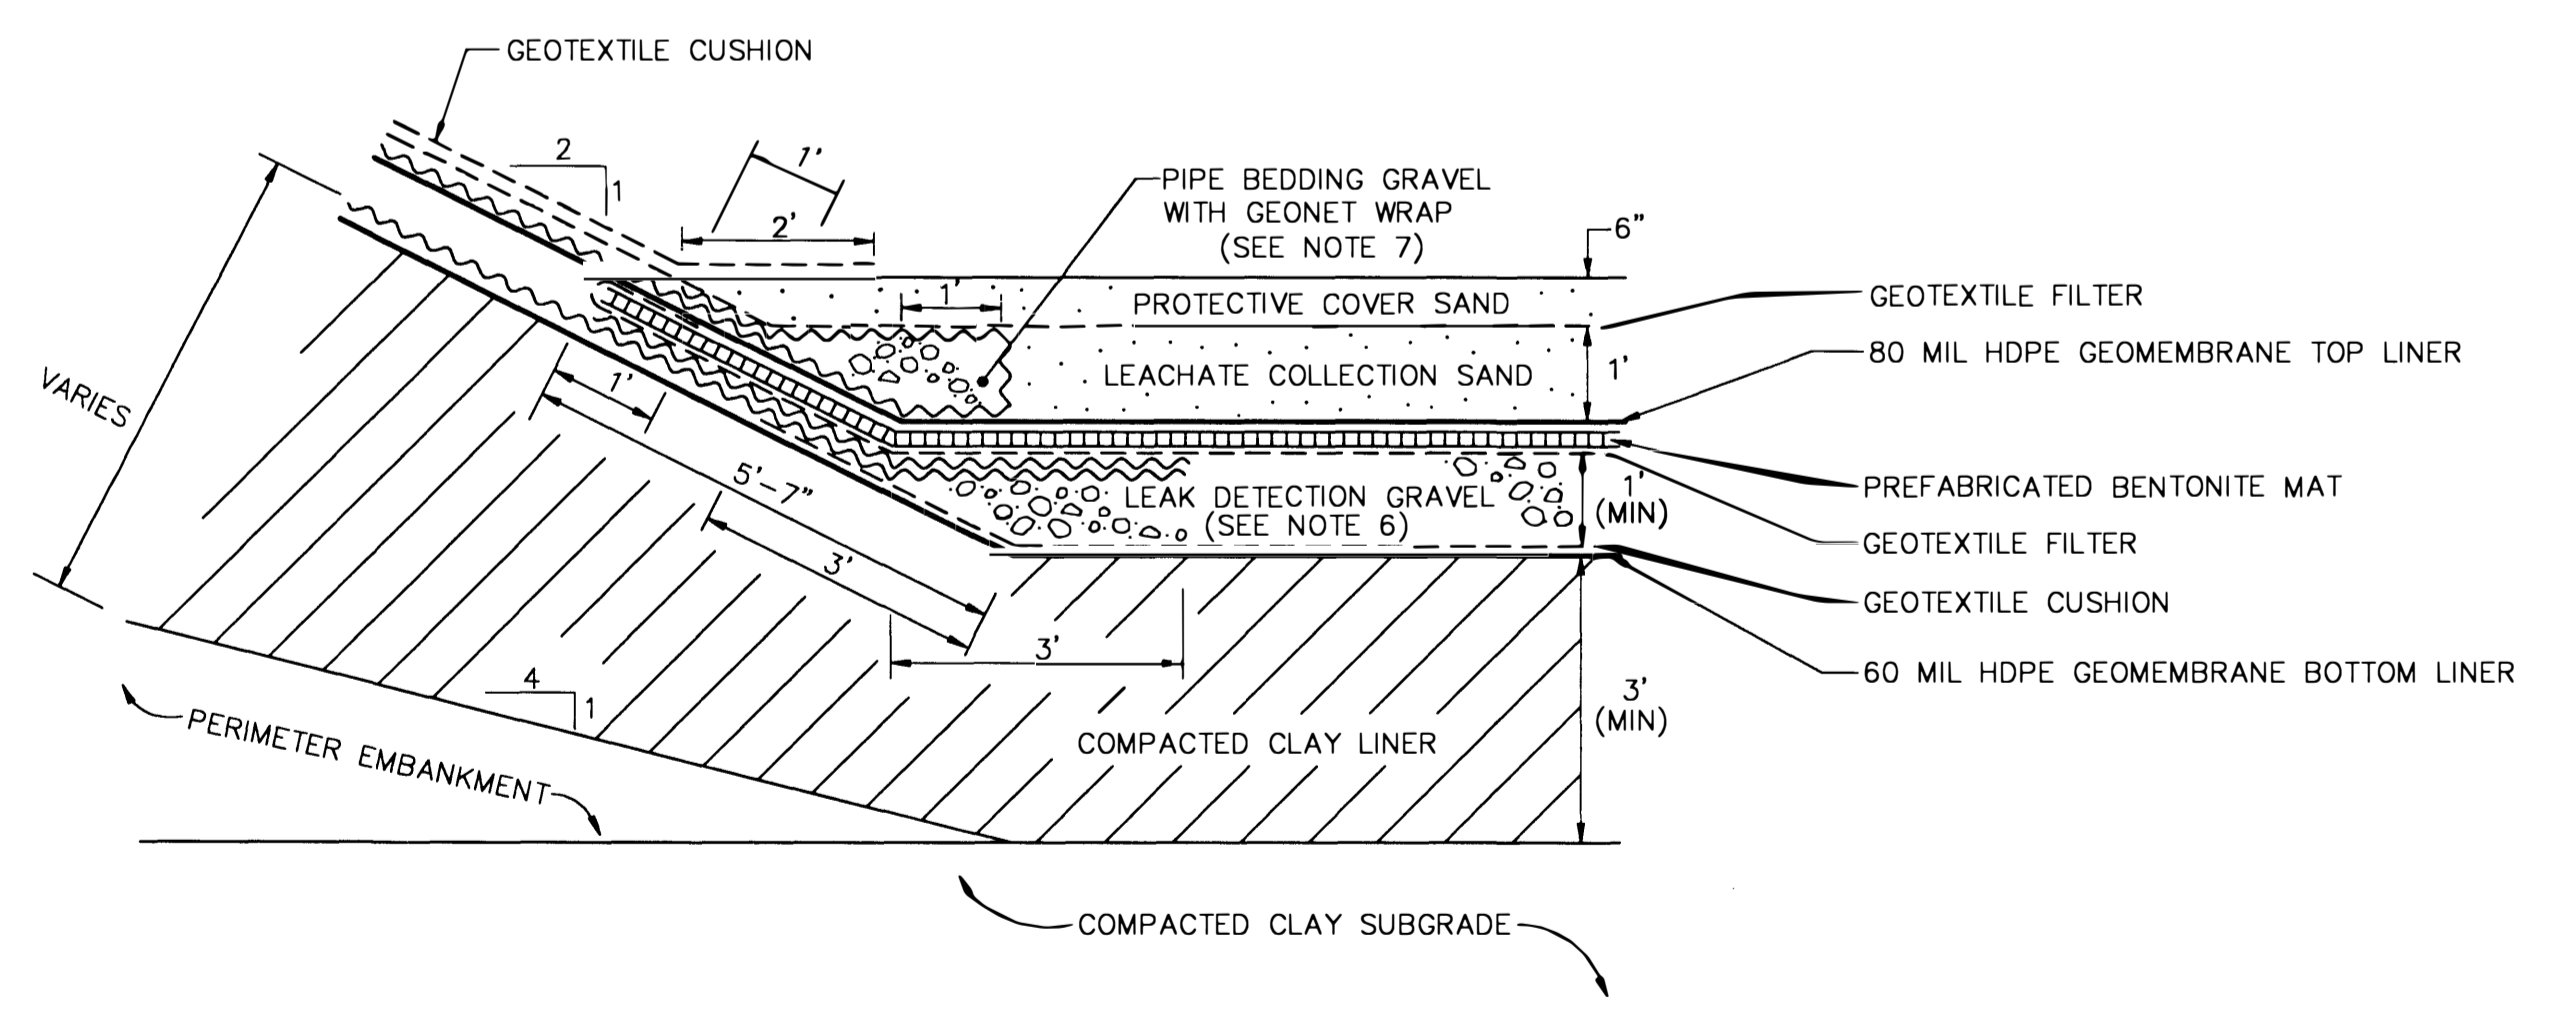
Above Ground Hazardous Waste Landfill No. 2 Liner System Details
